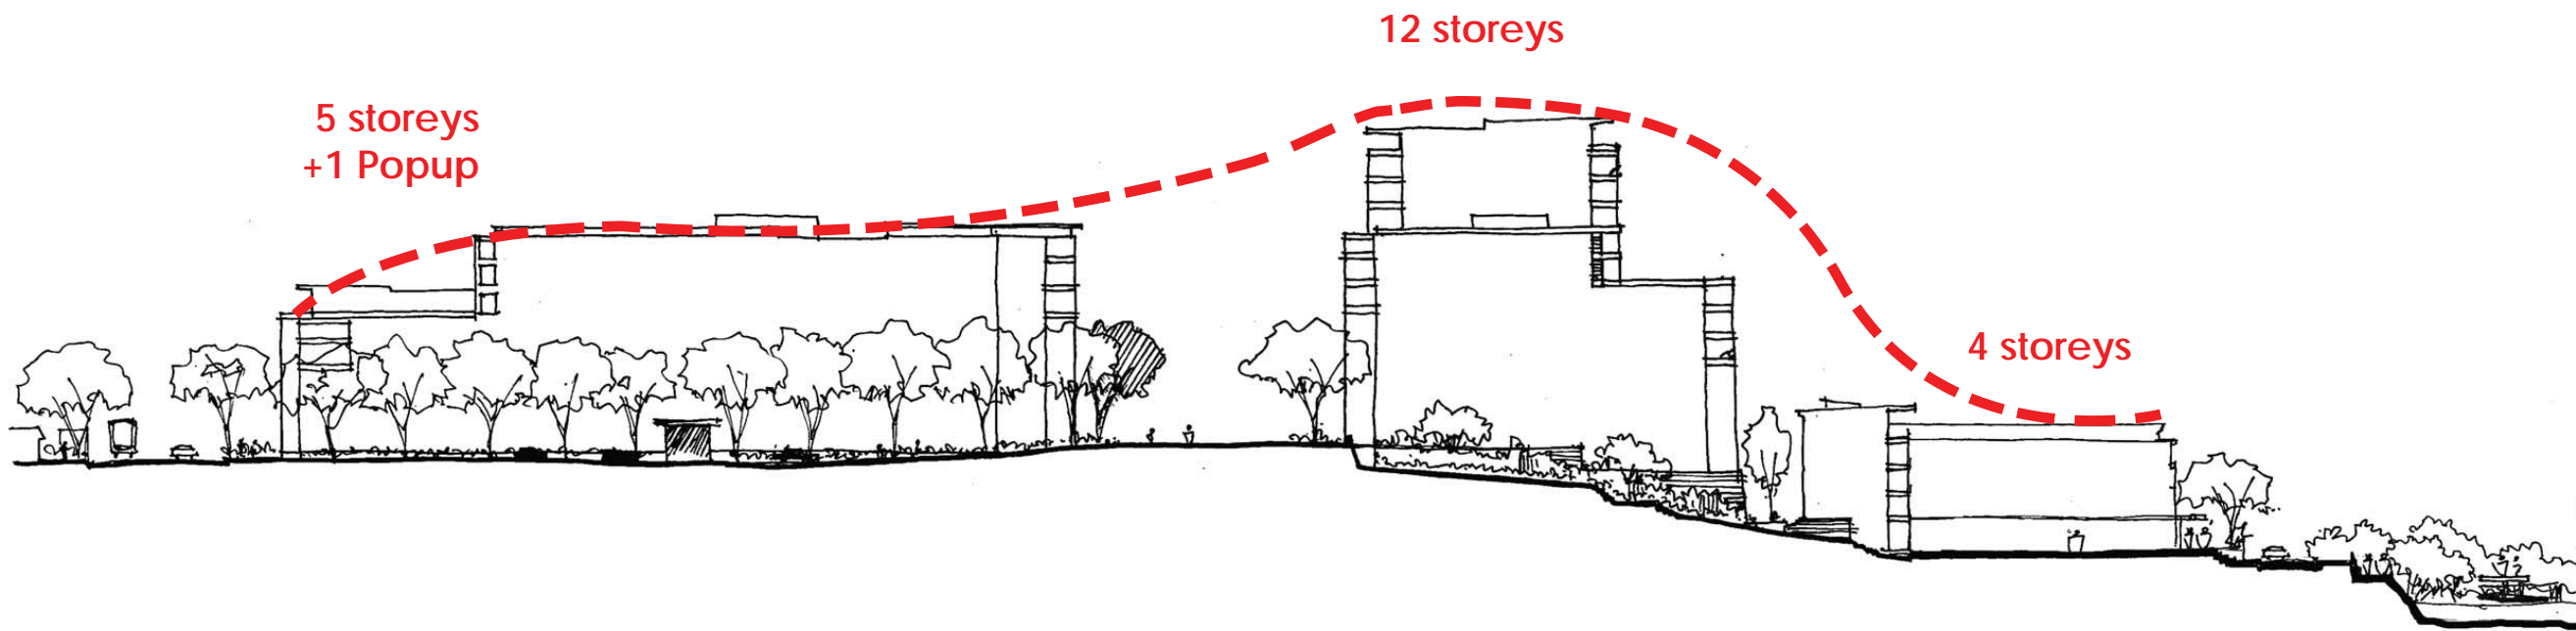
TERRACE CONCEPT - LONG SECTION THROUGH SITE DOWN TO WATER
